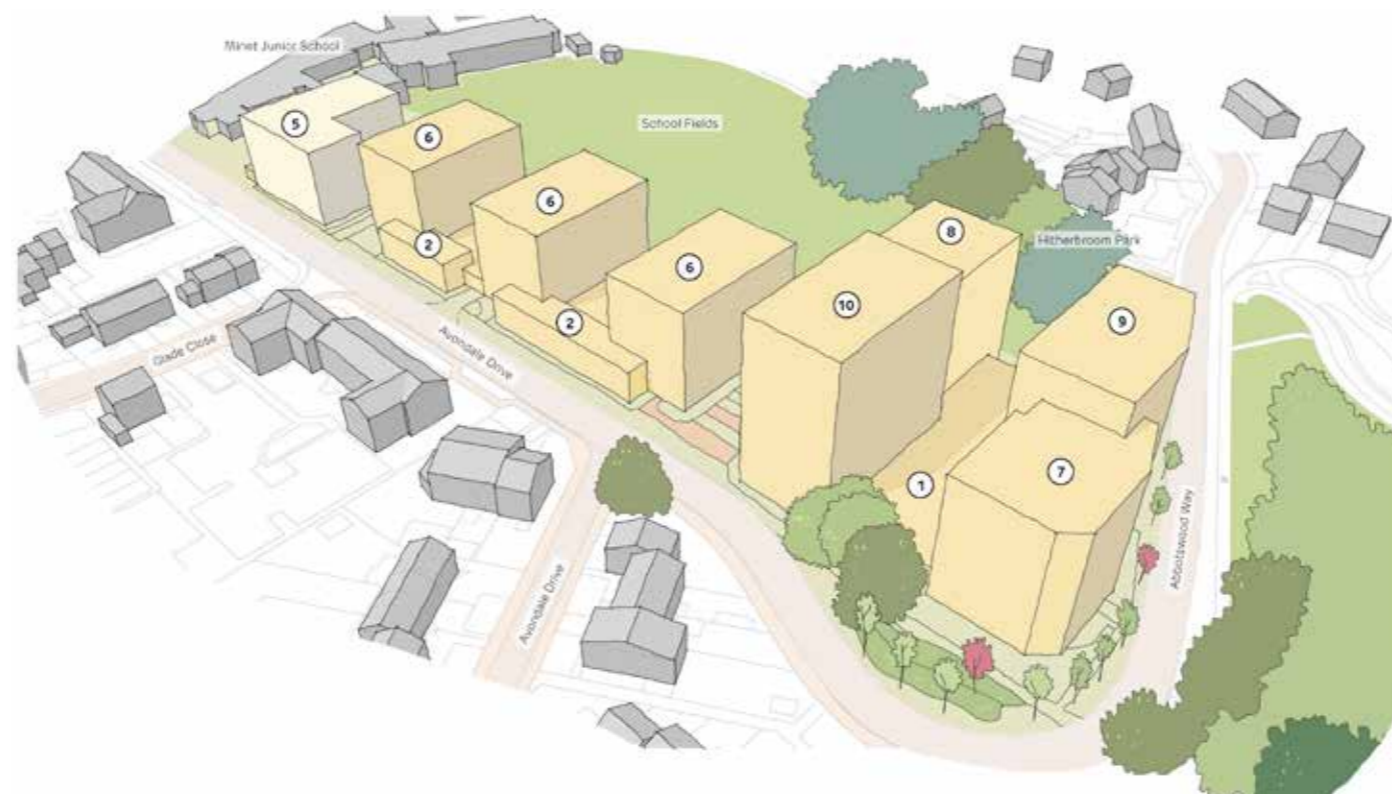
Illustrative masterplan proposed building heights. Source: PRP DAS.
